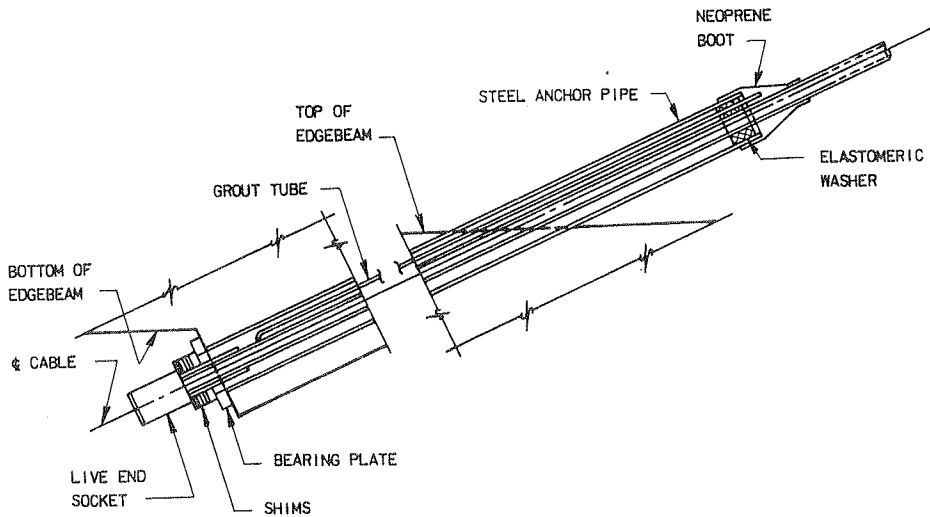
Concrete alternative: edge beam cable attachment details.
